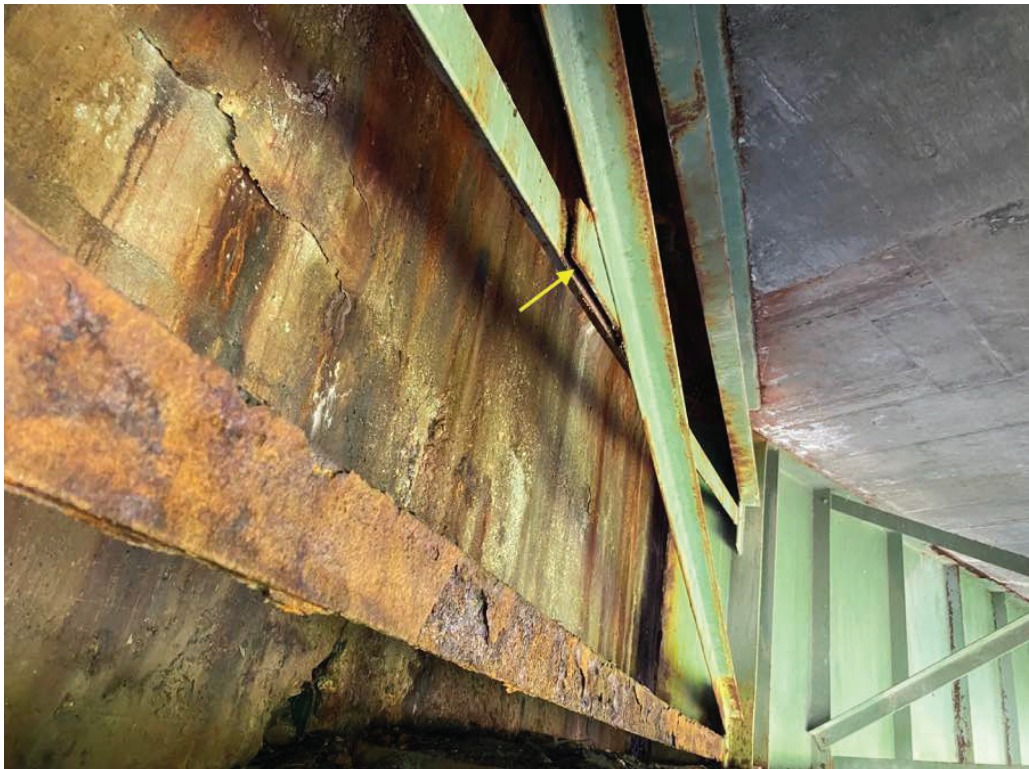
Bay 2 at east abutment, cross frame with broken weld at joint plate (typical). Also note spalling, rust staining and delamination in the backwall.
